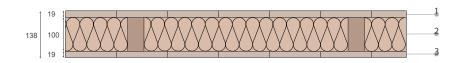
Internal wall structural detail scale 1:20 [63].
